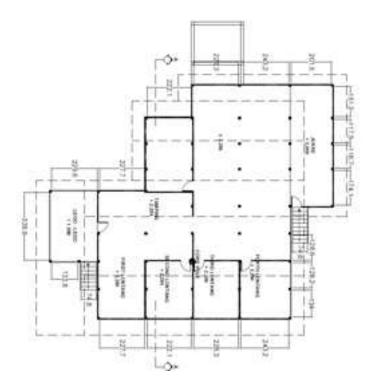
Z2-PL-32 : Floor plan. Source : Field survey 2015
